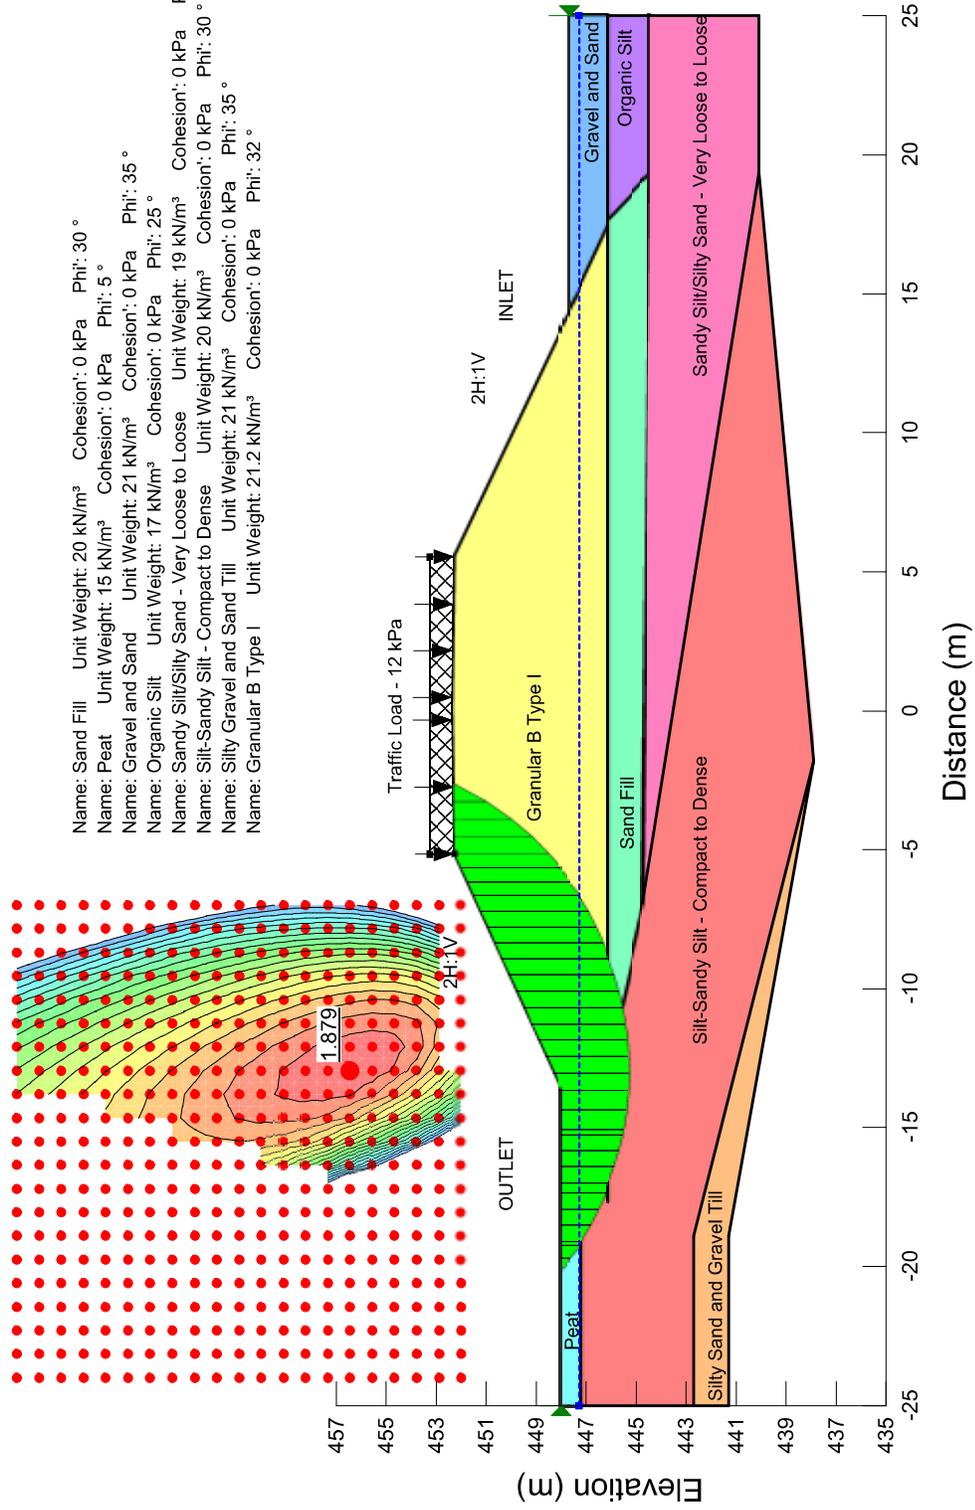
Proposed Embankment Stability - Inlet Side
